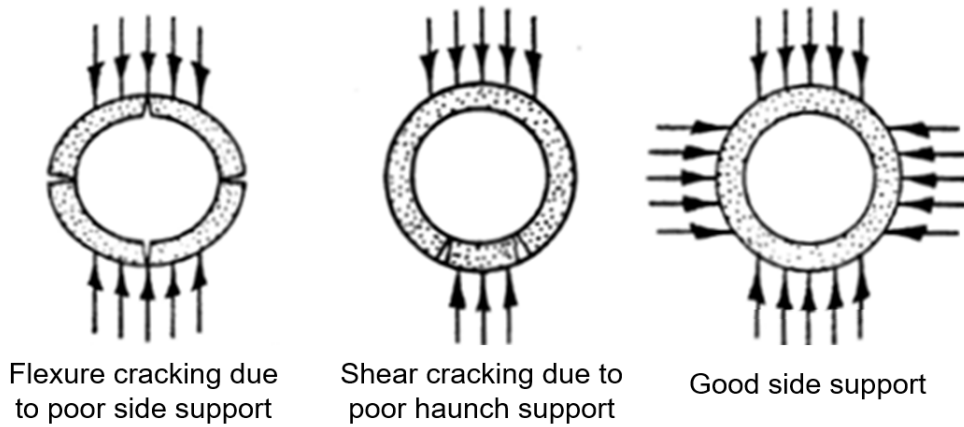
Longitudinal Cracks in Pipe Culvert
